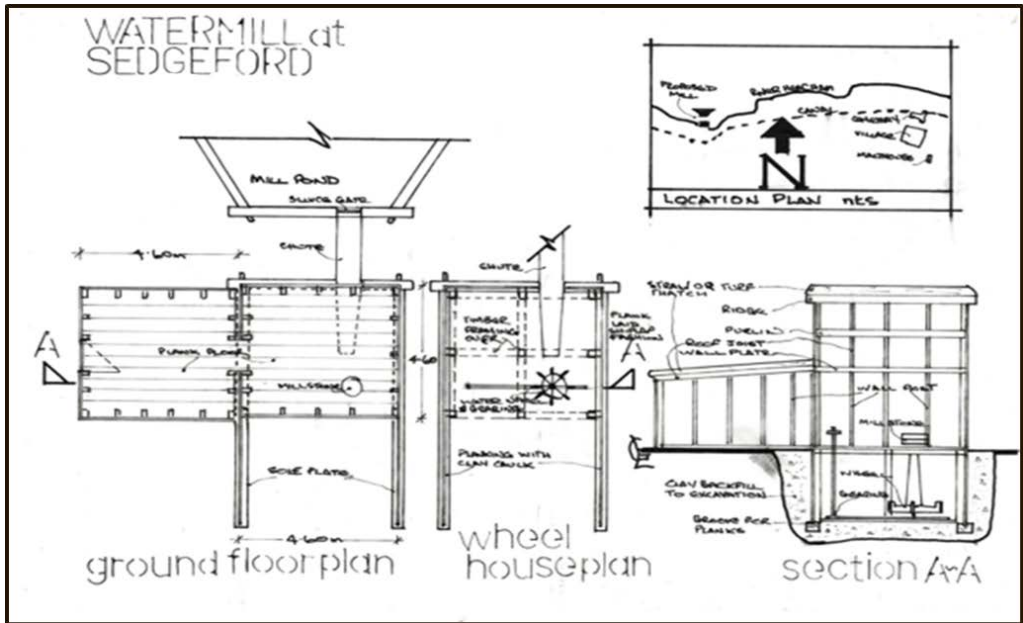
Construction of the vertical-axle and horizontal-wheel watermill.
